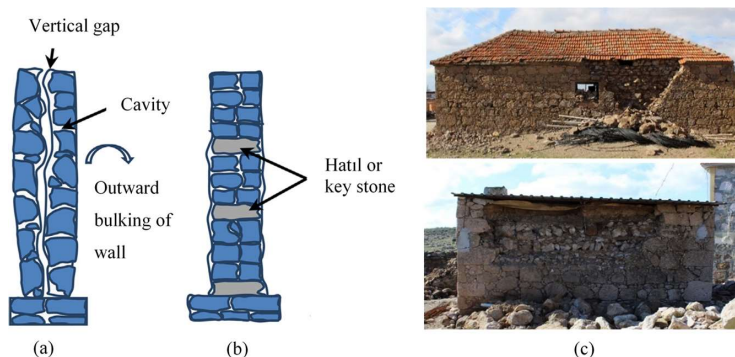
Schematics of a conventional wall section without through stone, b wall section with through stones (Sharma, 2016) c observed damages in the region.
